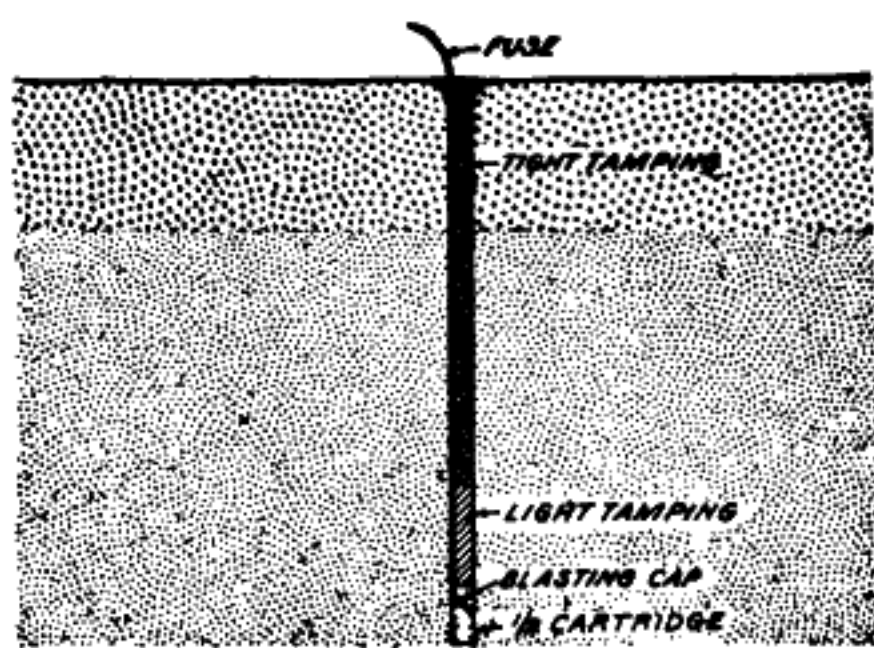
Top of hole tamped tight by means of a tamping stick used in one hand.
